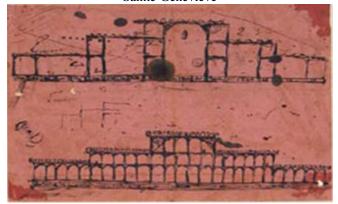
Sir Joseph Paxton (1801-65), Facsimile of the First Sketch for the Great Exhibition Building, About 1850, Pen and ink on blotting paper V&A Museum no. E.941-1983 Source:
